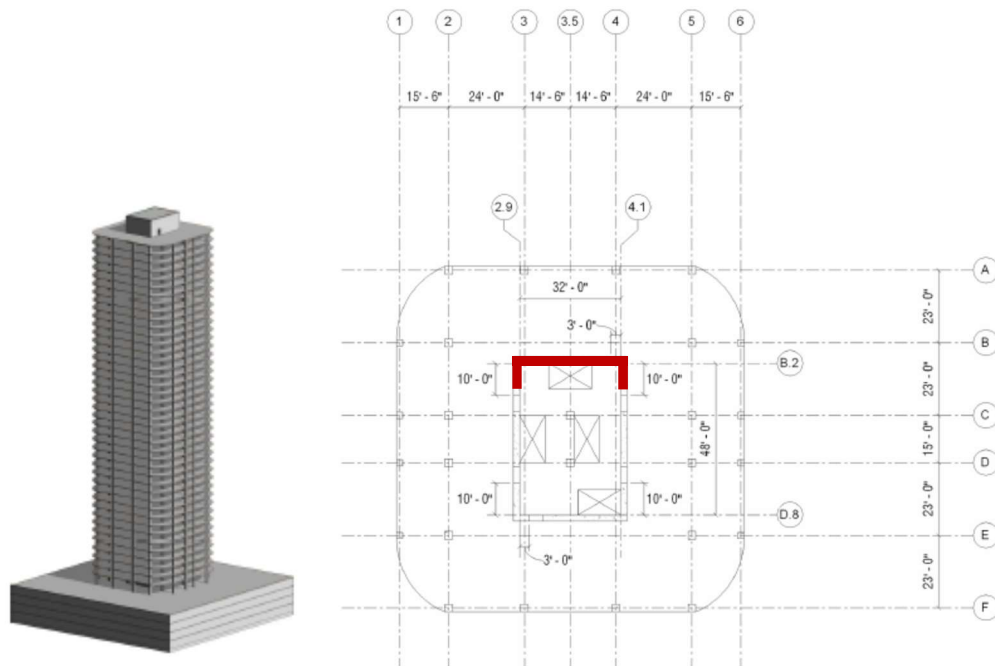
Building 1C tower plan (after Jack Moehle et al., 2011).
